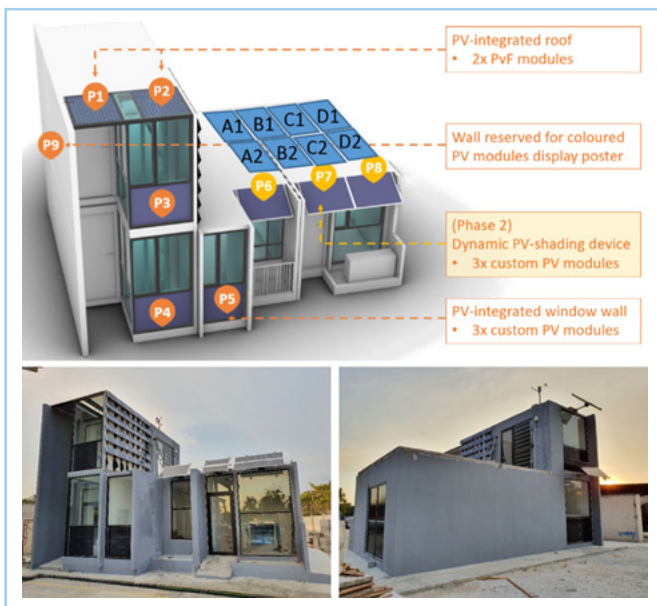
Concrete PPVC units with installed BIPV/BAPV
